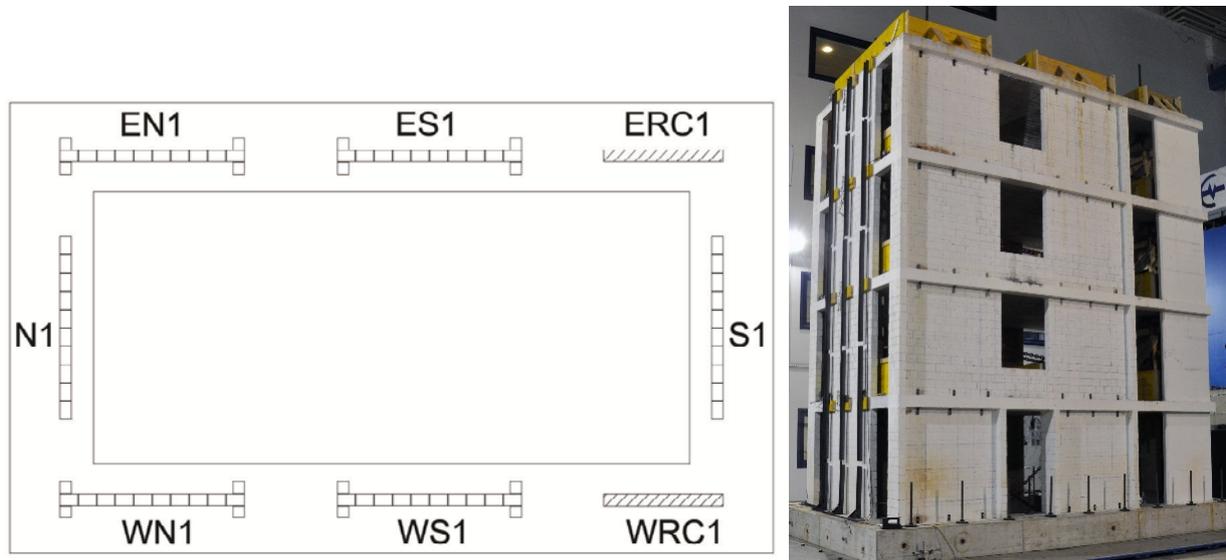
Plan view with cardinal directions (left) and South/West view of the test unit over the shake table (right)
